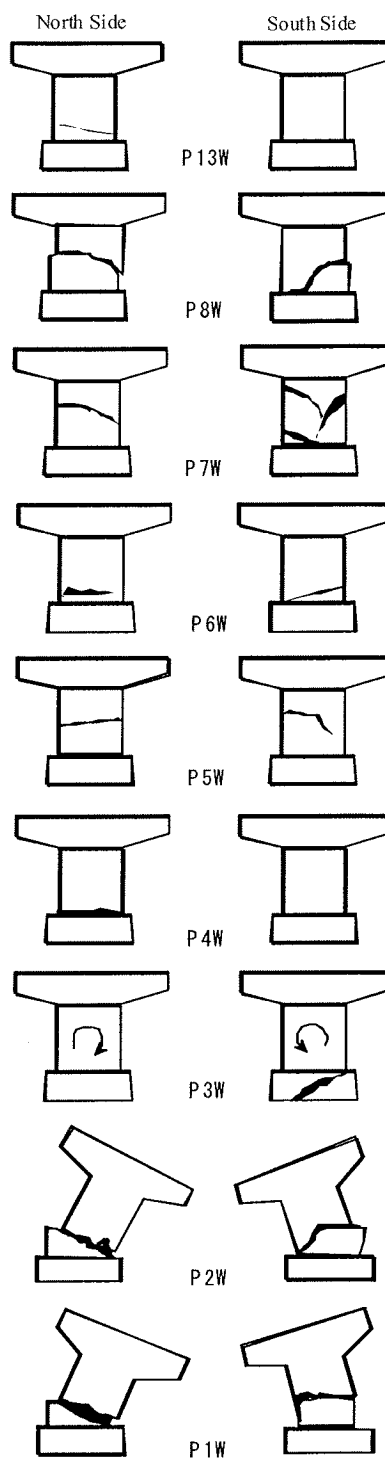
Failure of Piers, Wu-Shi Bridge
